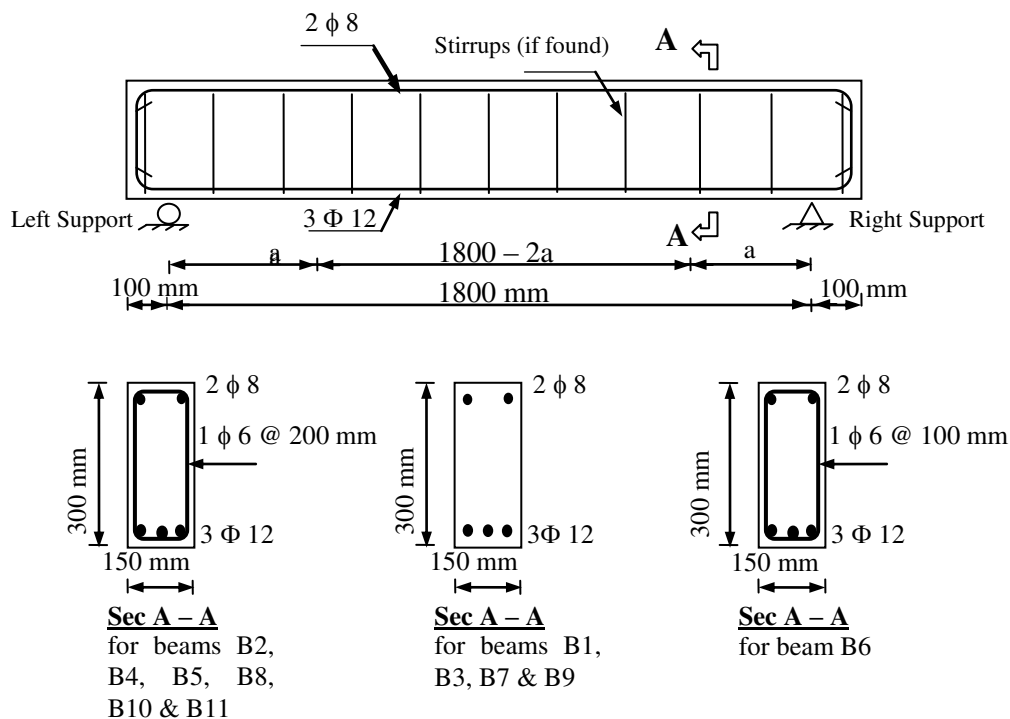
Geometrical and Reinforcement Details of the Tested Beams
